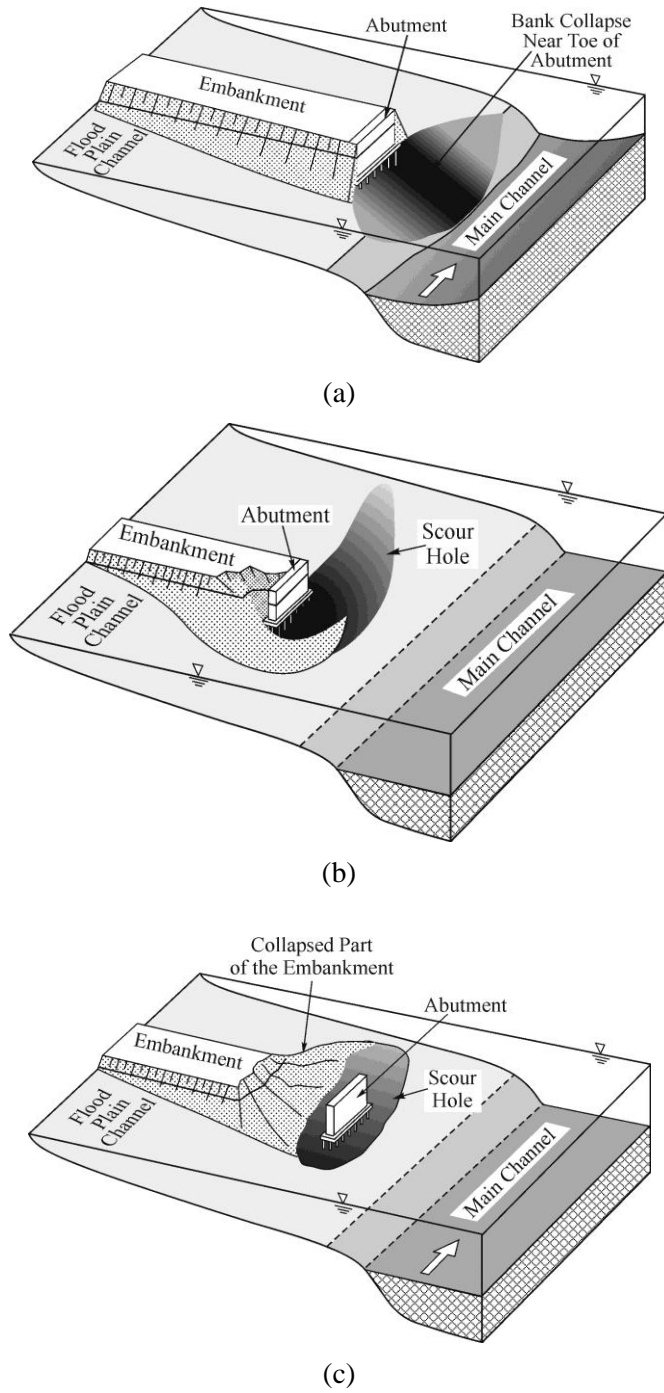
Abutment-scour conditions: (a) Scour Condition A — hydraulic scour of the main-channel bed causes bank failure, which causes a failure of the face of the abutment embankment; (b) Scour Condition B — hydraulic scour of the floodplain causes failure of the face of the abutment embankment; (c) Scour Condition C — breaching of the approach embankment exposes the abutment column so that scour progresses as if the abutment were a form of pier.
